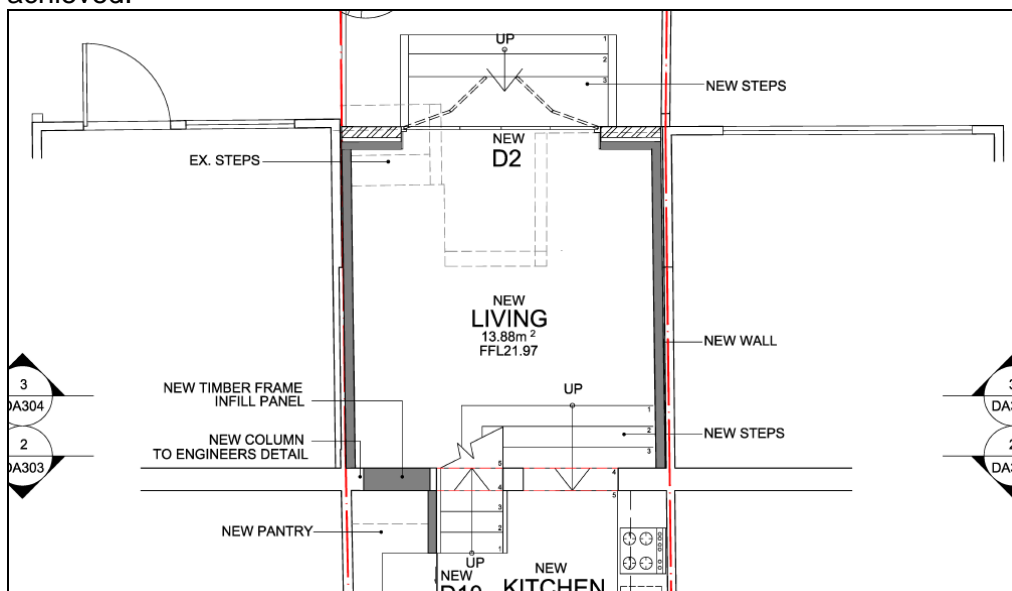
Extract from the submitted Floor Plan showing proposed new ground floor extension in line with those of the immediate adjoining properties.
